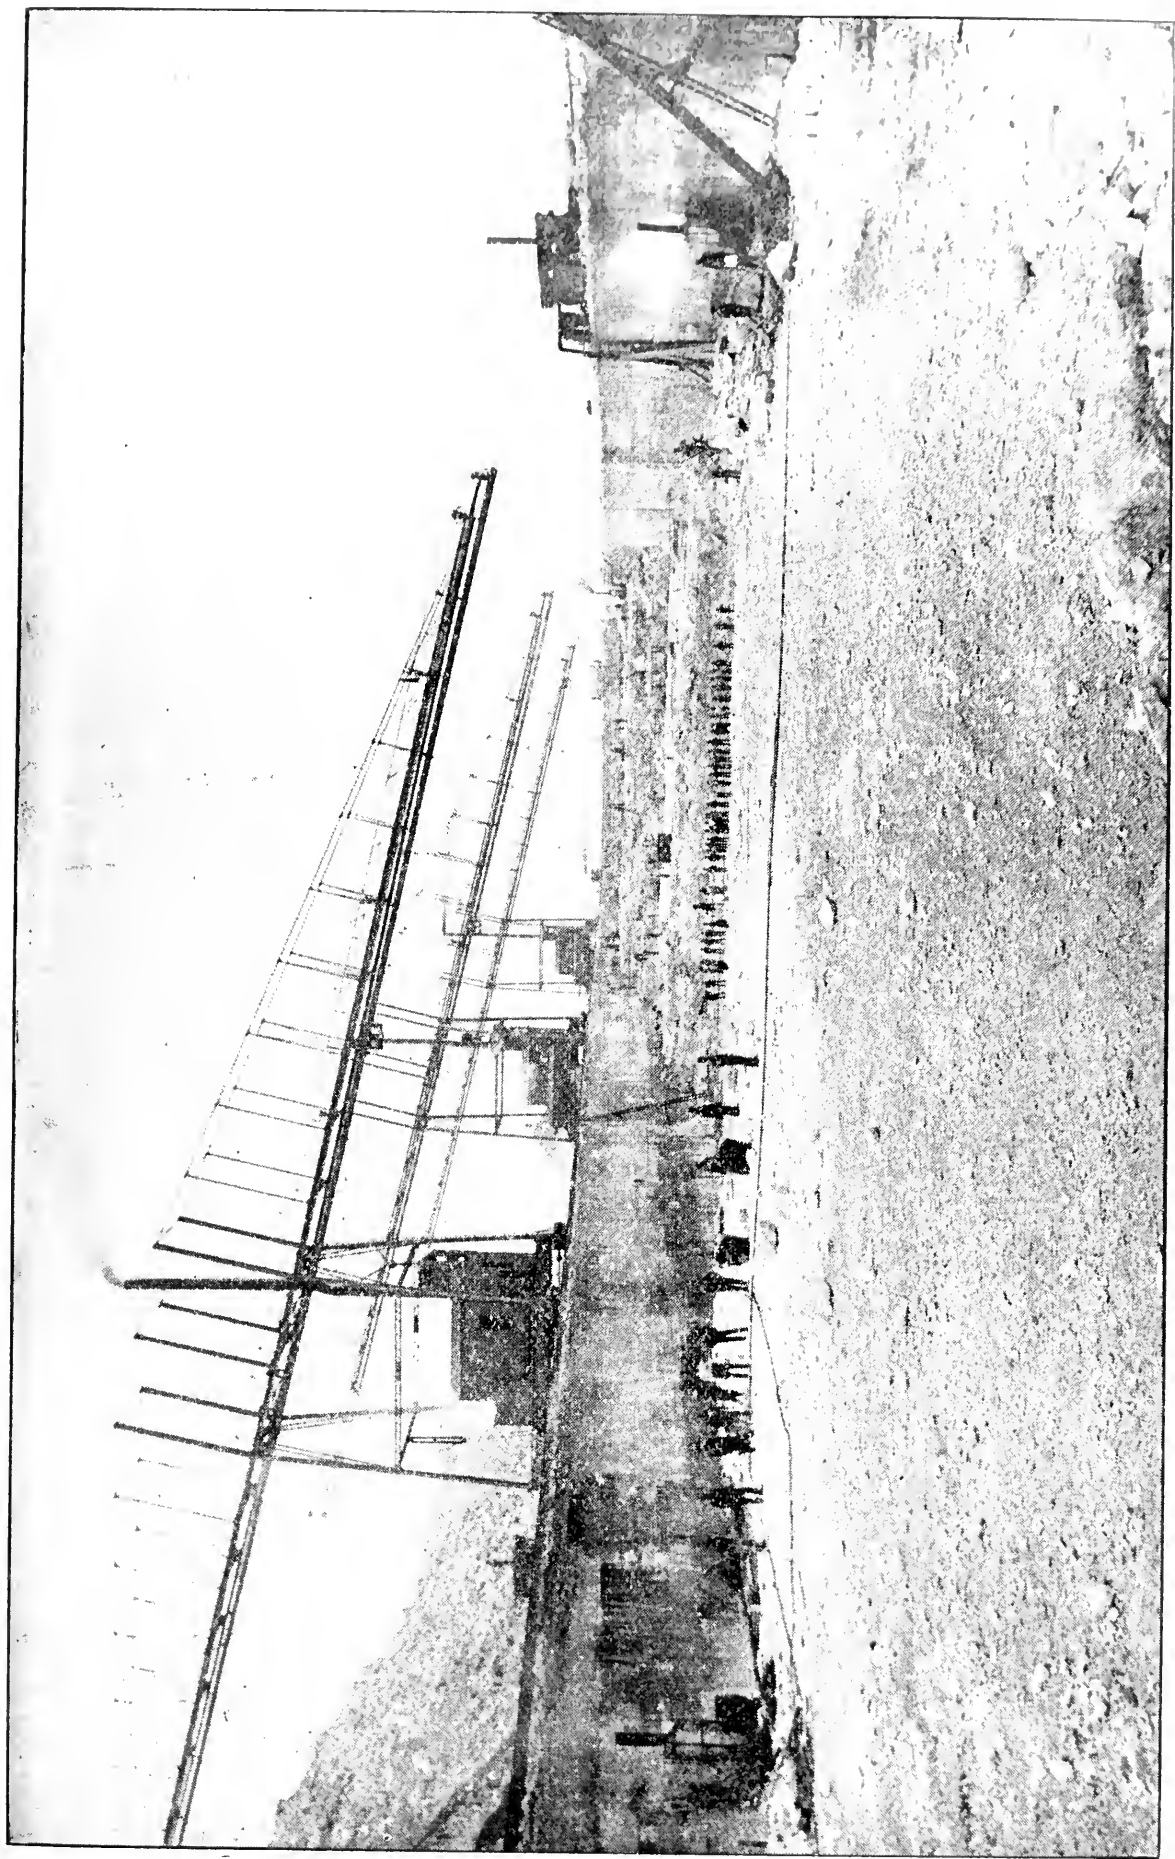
EXCAVATION IN ROCK FOR DRAINAGE CHANNEL AND WATERWAY. FULL DEPTH IN CENTER. BROWN CANTILEVER CONVEYOR.
